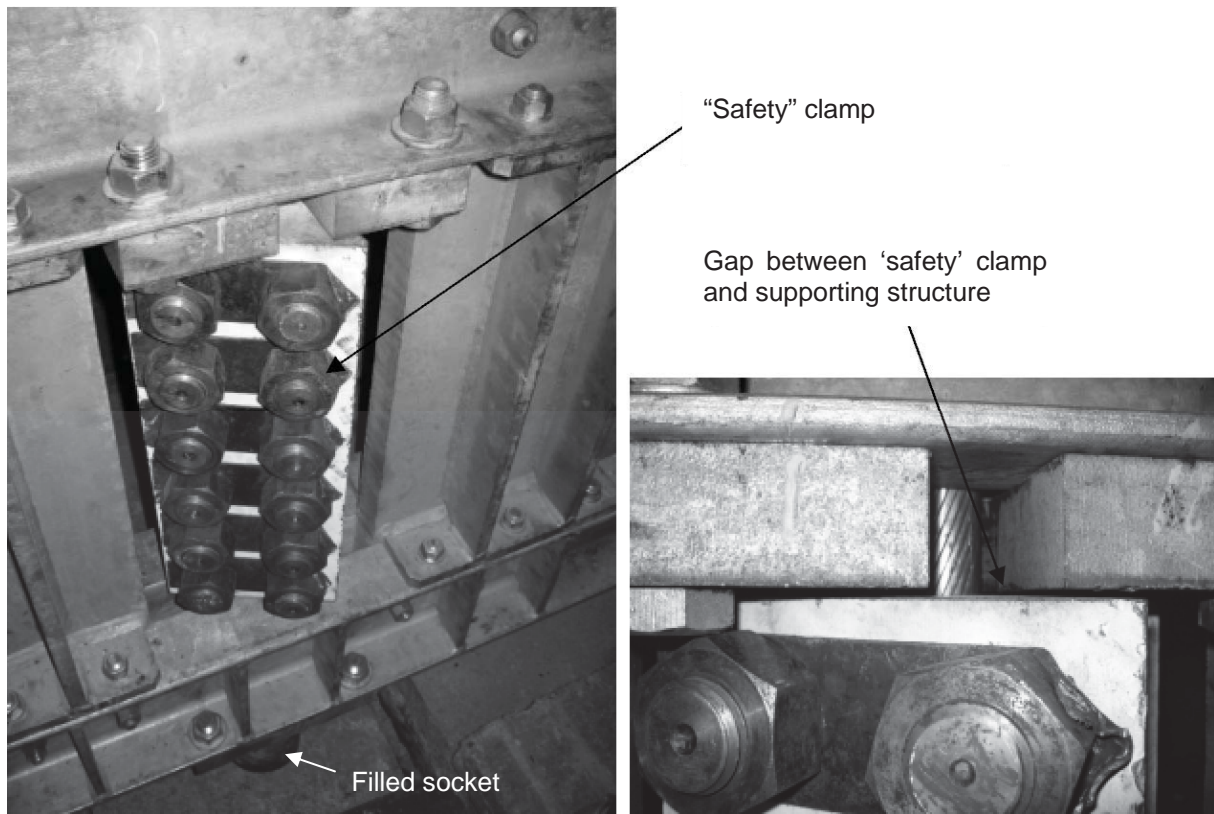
Showing an example of positioning of the safety clamp on an aerial ropeway installation – the clamp will only become axially loaded if the filled socket fails.
